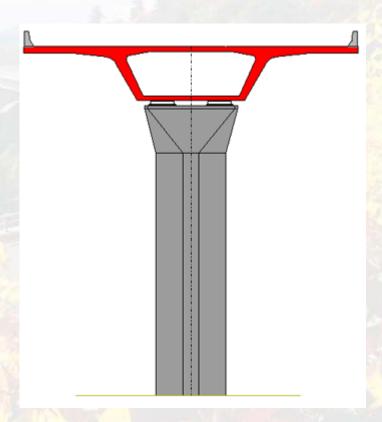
Possible Box Girder Bridge Superstructure Concept
